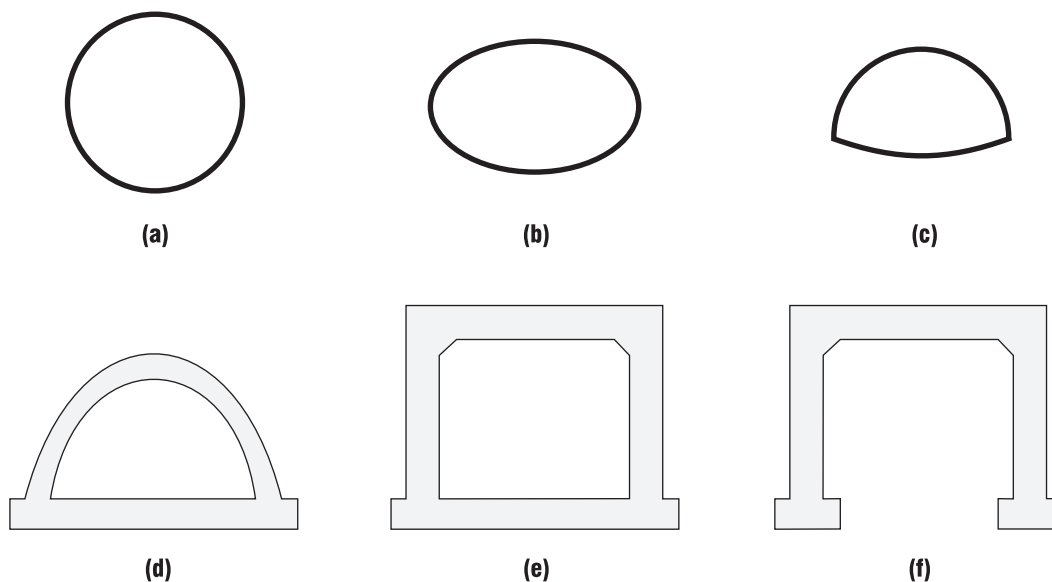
Culvert cross sections: (a) circular pipe, usually concrete, corrugated metal, vitrified clay, or cast iron; (b) elliptical pipe, generally reinforced concrete or corrugated metal; (c) precast concrete pipe arch; (d) corrugated metal or reinforced concrete arch; (e) reinforced concrete box culvert; (f) reinforced concrete bridge culvert.
